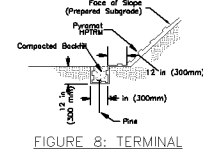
TERMINAL TRENCH AT TOE OF SLOPE DETAIL
